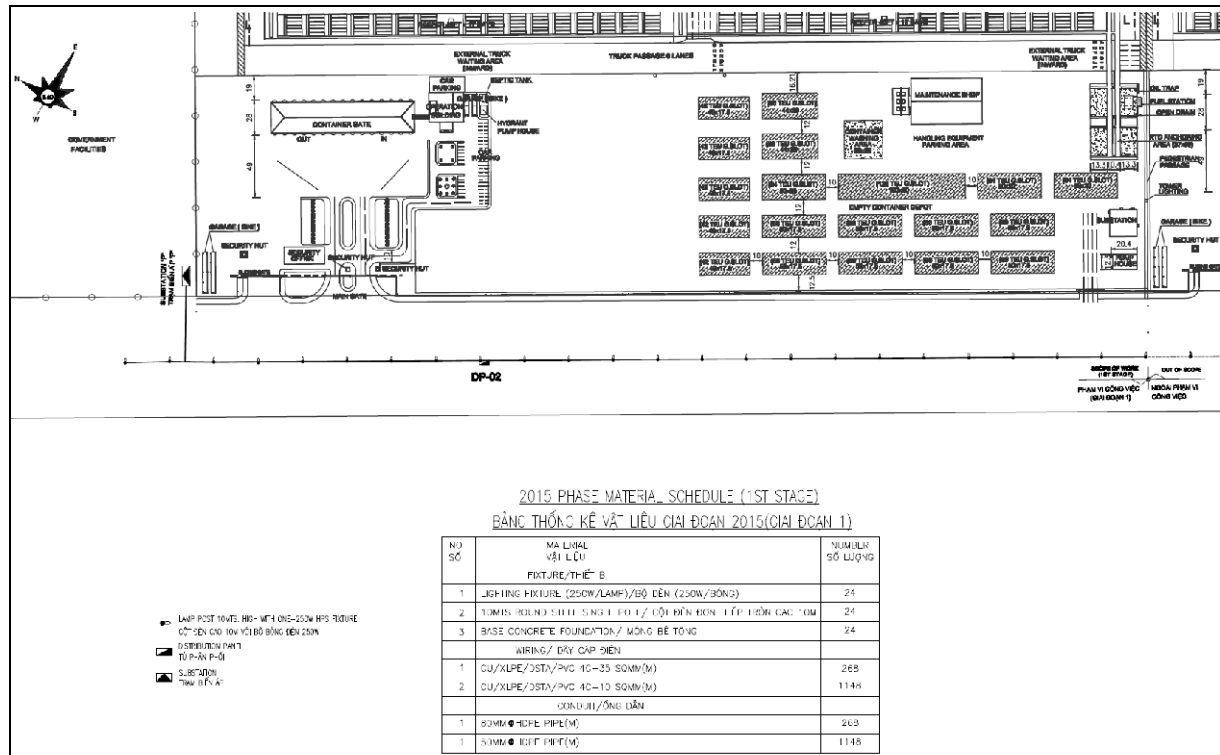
Road Lighting Layout for Terminal Access Area 1st Stage (Reference Only)
